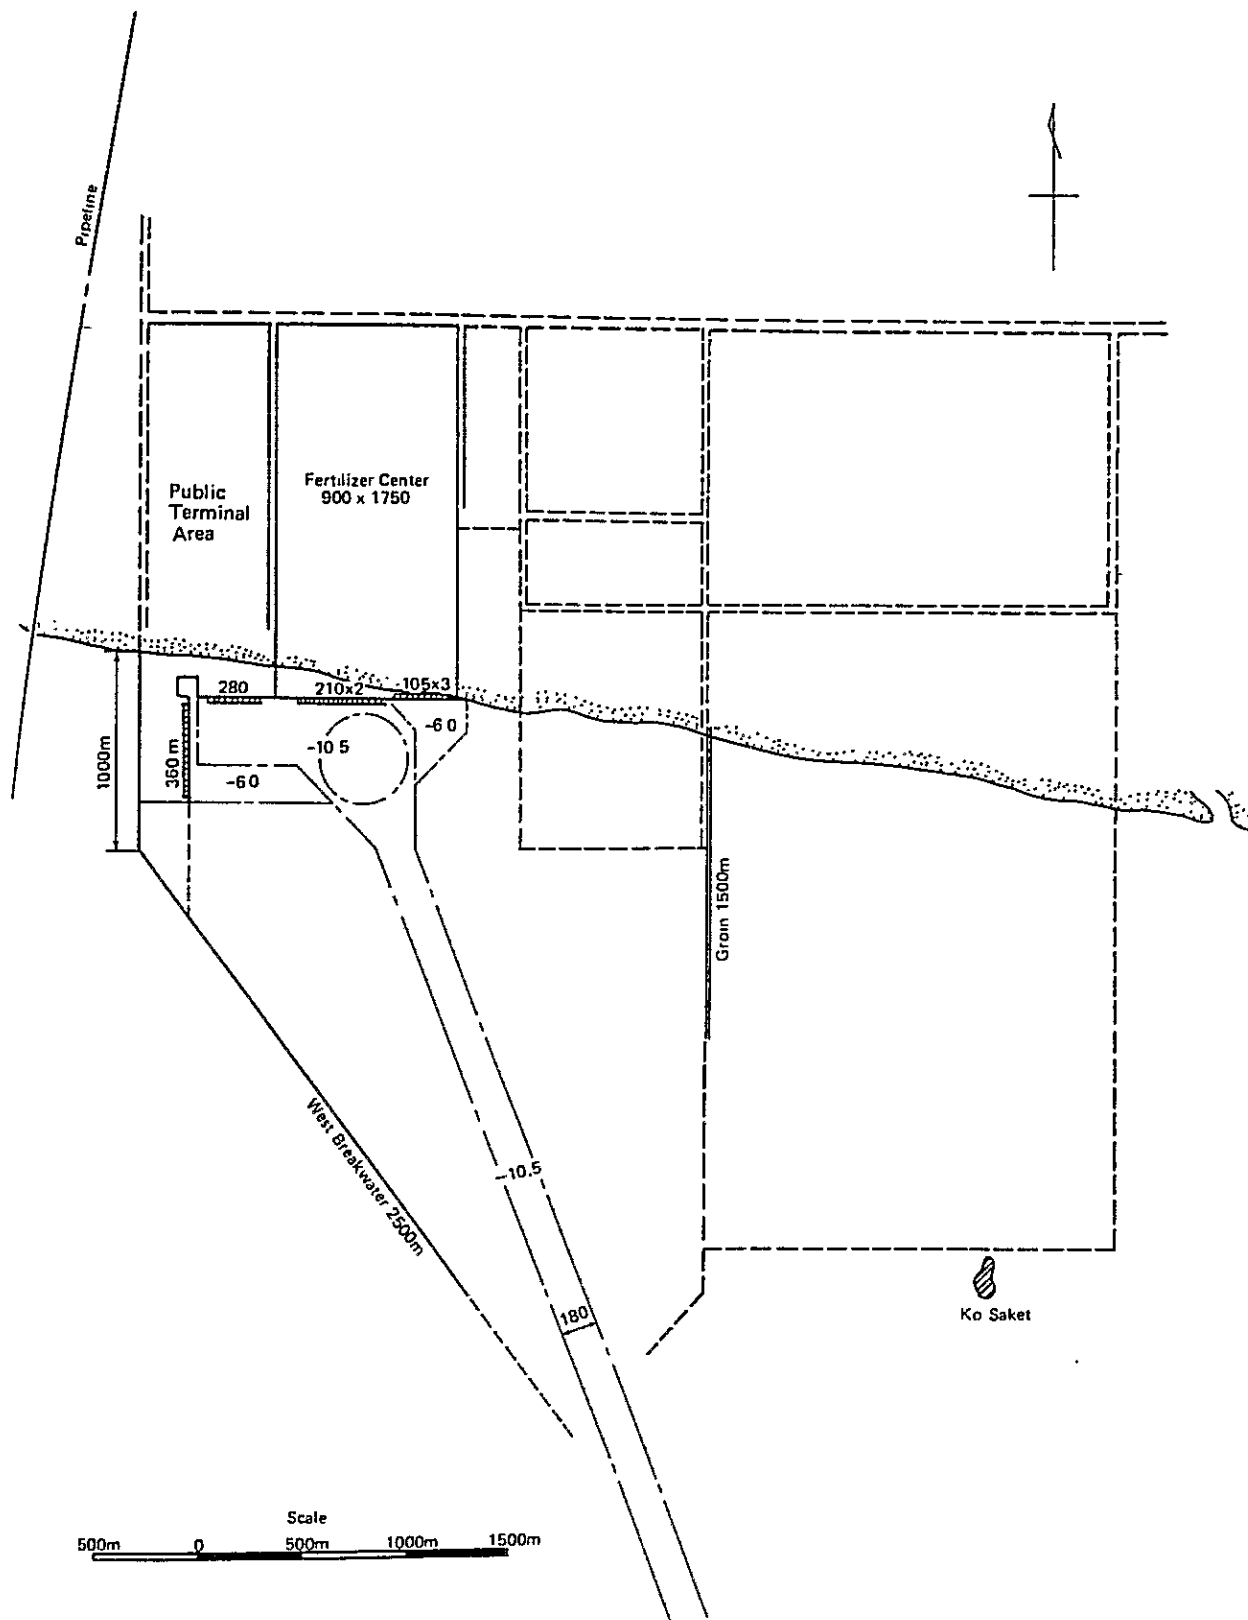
Berth Arrangement [Excavated Type] -(2)
